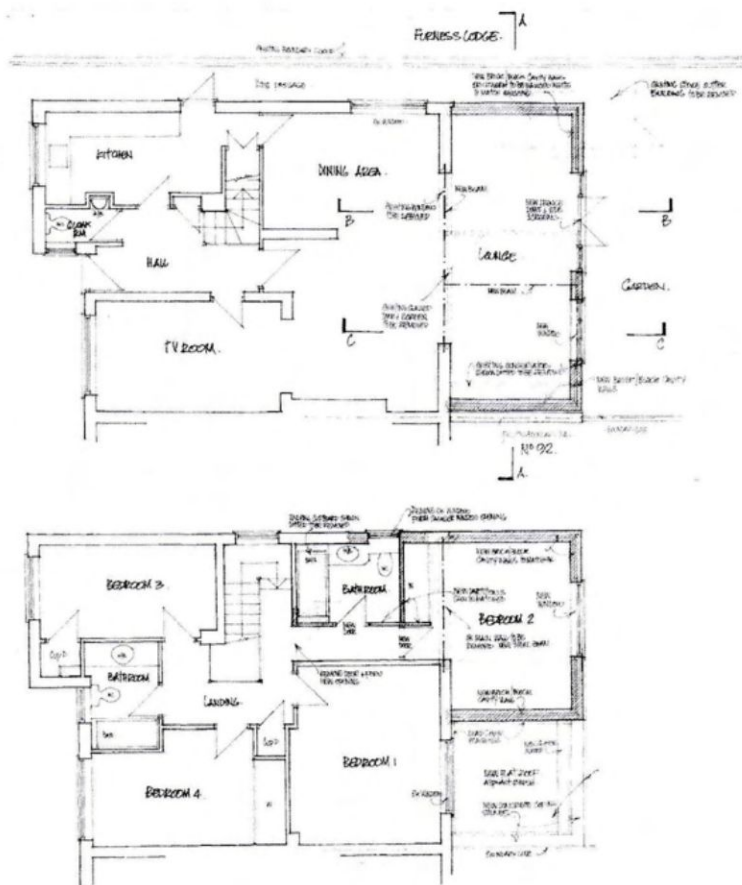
2003-approved ground and first floor plans showing 3.2m deep rear extension to 94 Temple Sheen Road(03/3092/HOT)
